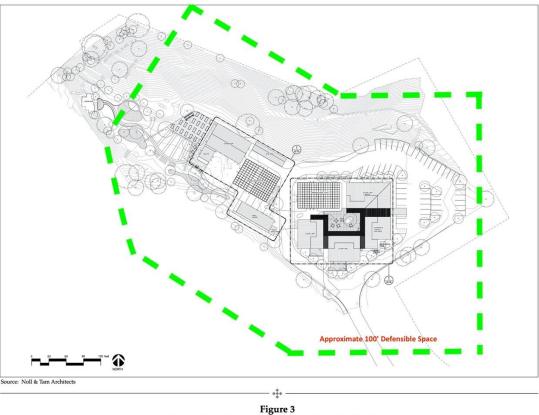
Proposed Landscape Horticulture Complex Site Plan
